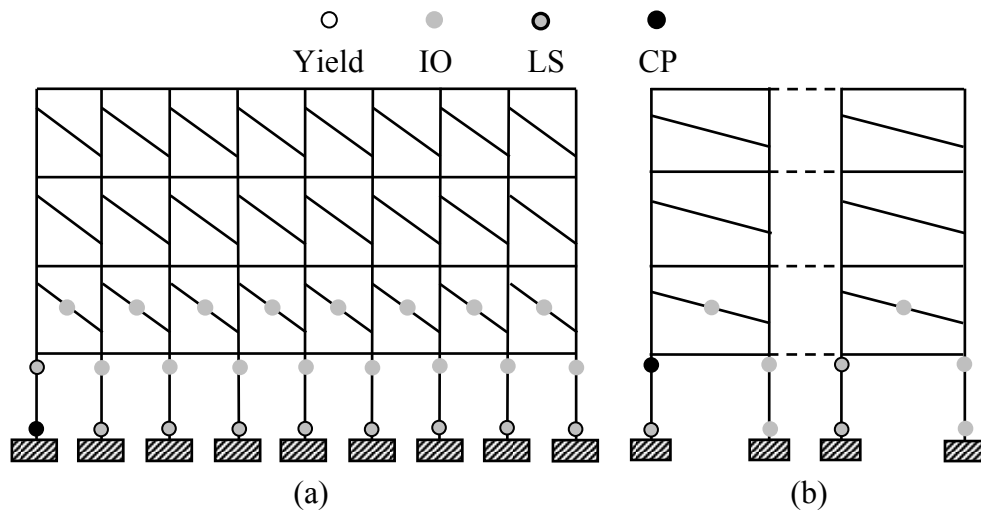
Collapse mechanism of four storey RC infilled frame buildings with open ground storey, designed as SMRF without considering provisions of BIS (2002) for open ground storey: (a) typical longitudinal frame; (b) typical transverse frame.
